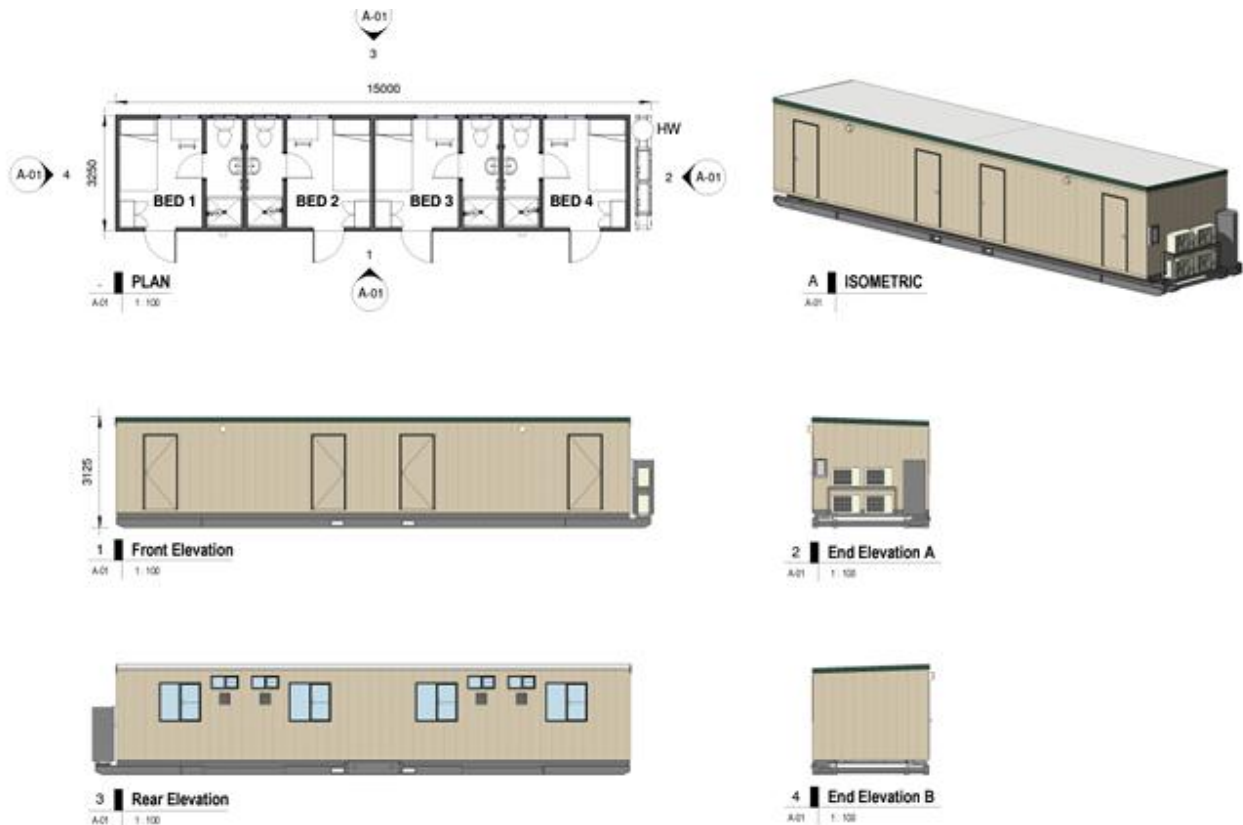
Typical demountable buildings with one-bedroom unit & ensuite
